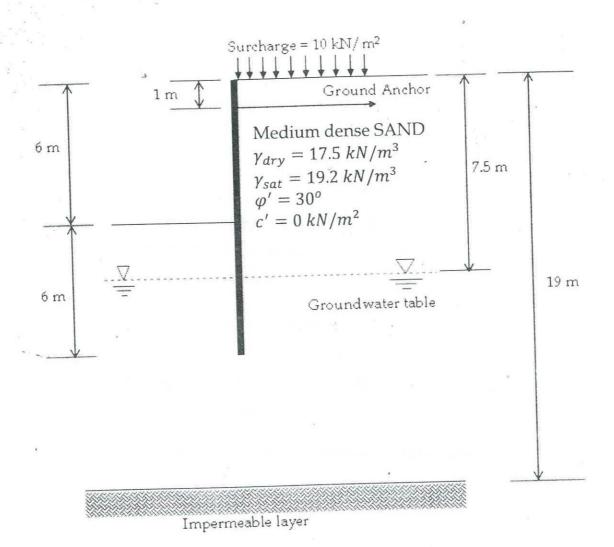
Proposed anchored sheet pile wall arrangement
